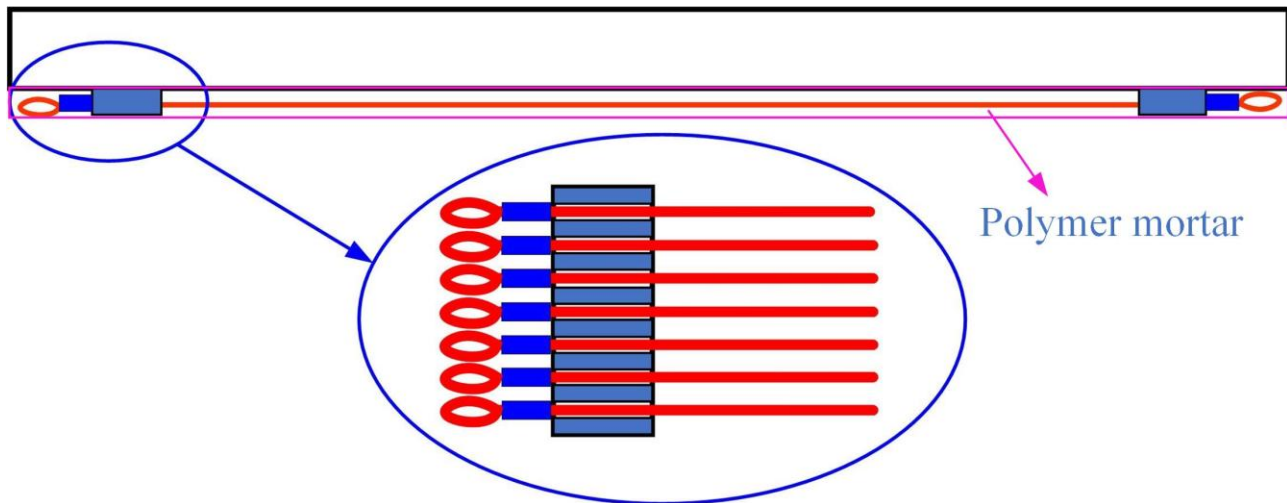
Schematic Diagram of the Anchoring System for Hollow Slab Reinforcement
